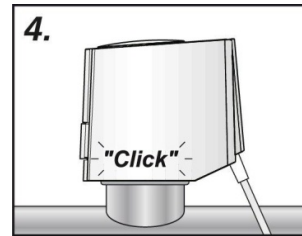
Step 4: Pressing down actuator onto valve adapter
